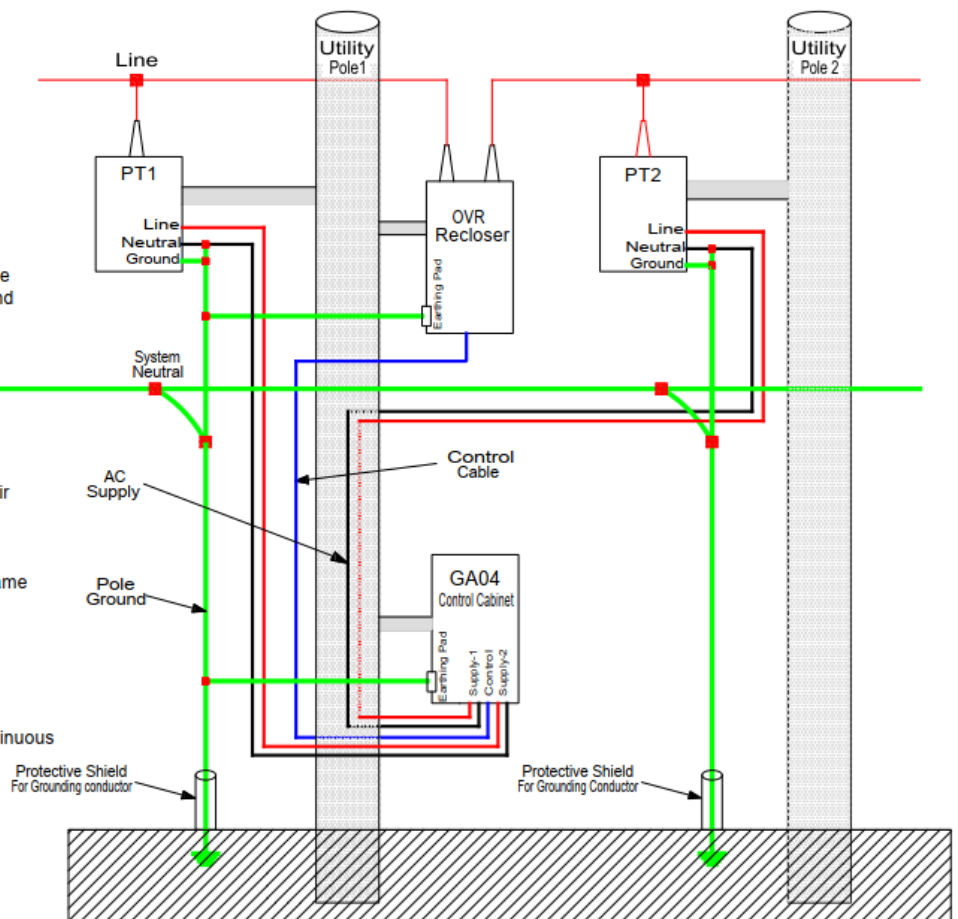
Grounding connections proposed for OVR-15,27,38 Pole Mounted arrangement
